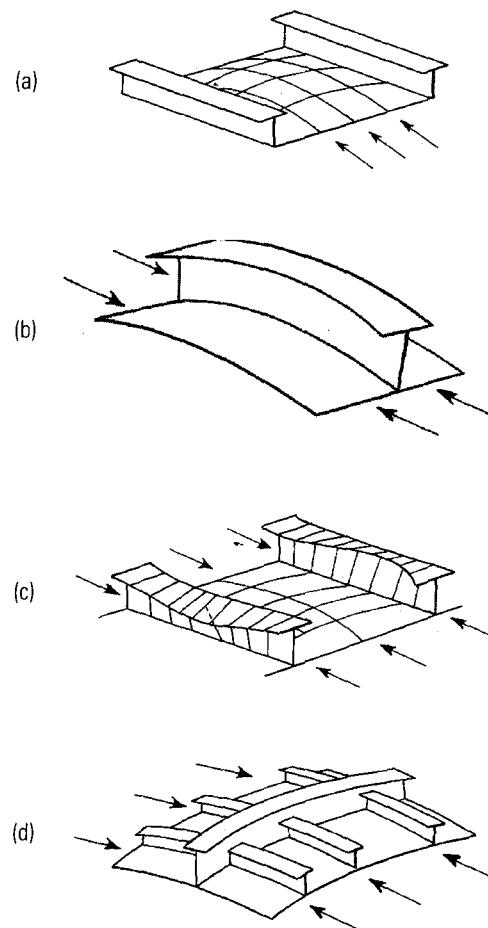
Modes of Failures by Buckling of a Stiffened Panel (2).
